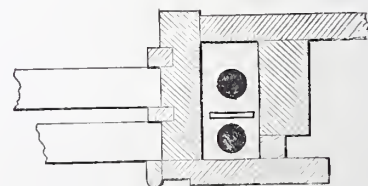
Horizontal Section Through a Box Window Frame for a Frame Building.—Scale, $\frac{3}{4}$ -Inch to the Foot.
